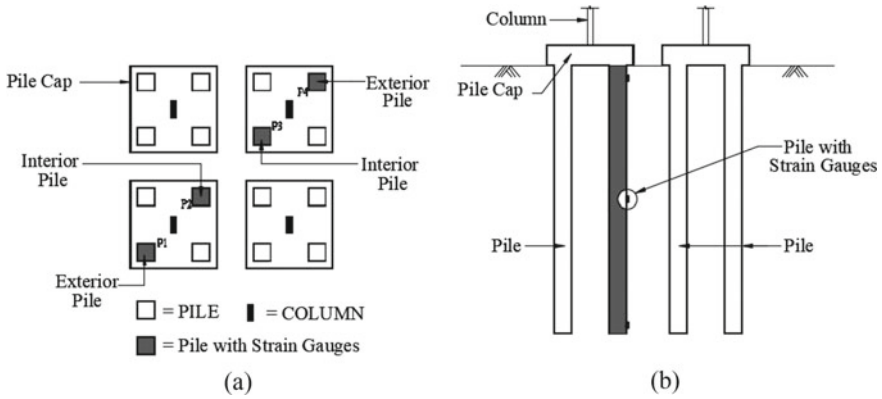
Schematic representation of model pile and pile cap: a Plan; b Sectional elevation
